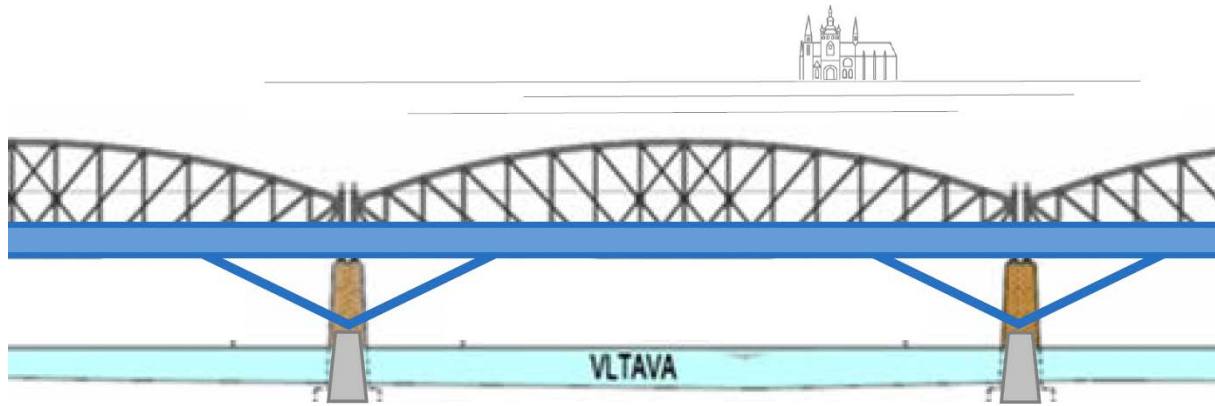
Proposal for a design principle for a new single track railway bridge next to the “Railway Bridge”.
